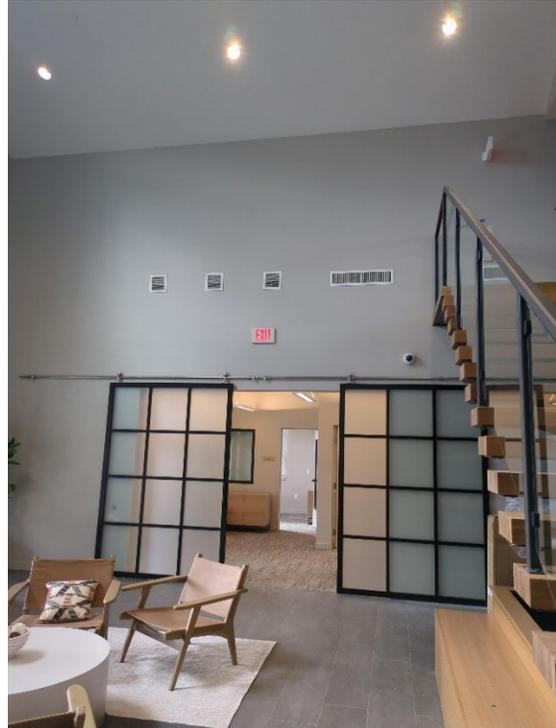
View into the Clubhouse (south) Work Room during building site assessment (7/17/23).
